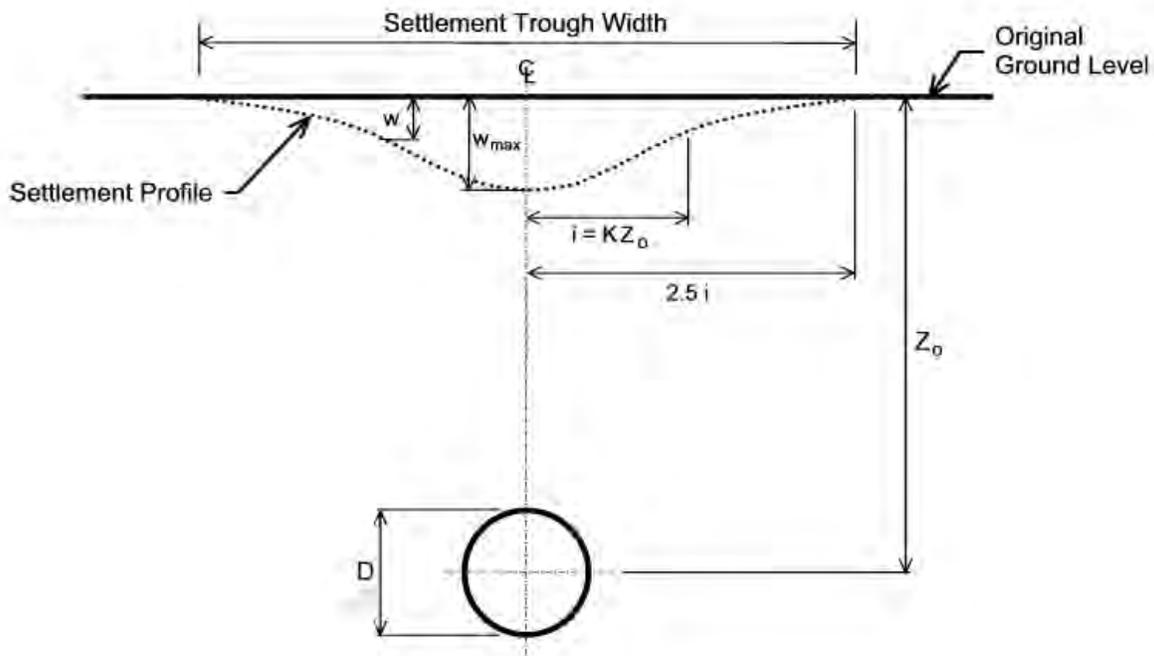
Typical Settlement Profile for a Soft Ground Tunneling
